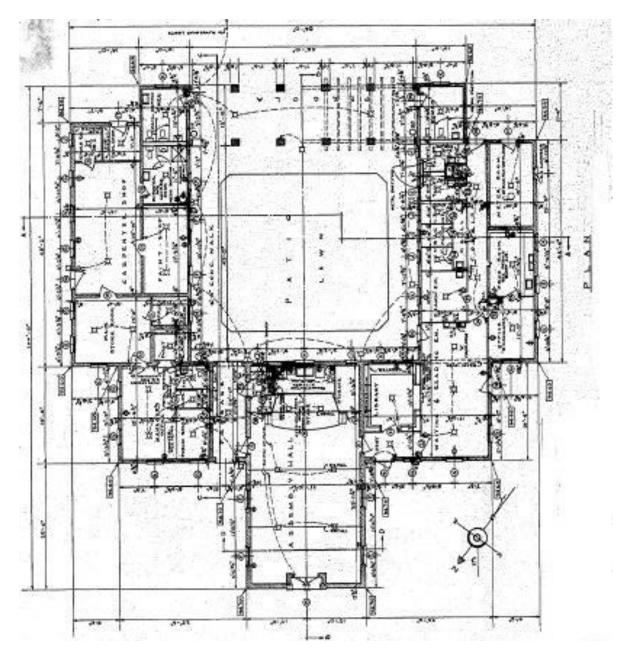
1939 floor plan of the Community Activity Building. USHA Housing Project TEX 3-2; sheet number A14 – Administration Bldg. Shelter and Tool House Plans and Elevations, dated Dec. 6, 1939 (Tays Place original drawings). Courtesy of HACEP.
